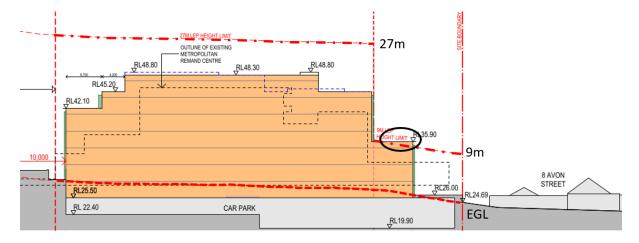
Proposed residential flat building envelope non-compliance depicted above the maximum permitted 9 metre height plane, which is outlined in black
